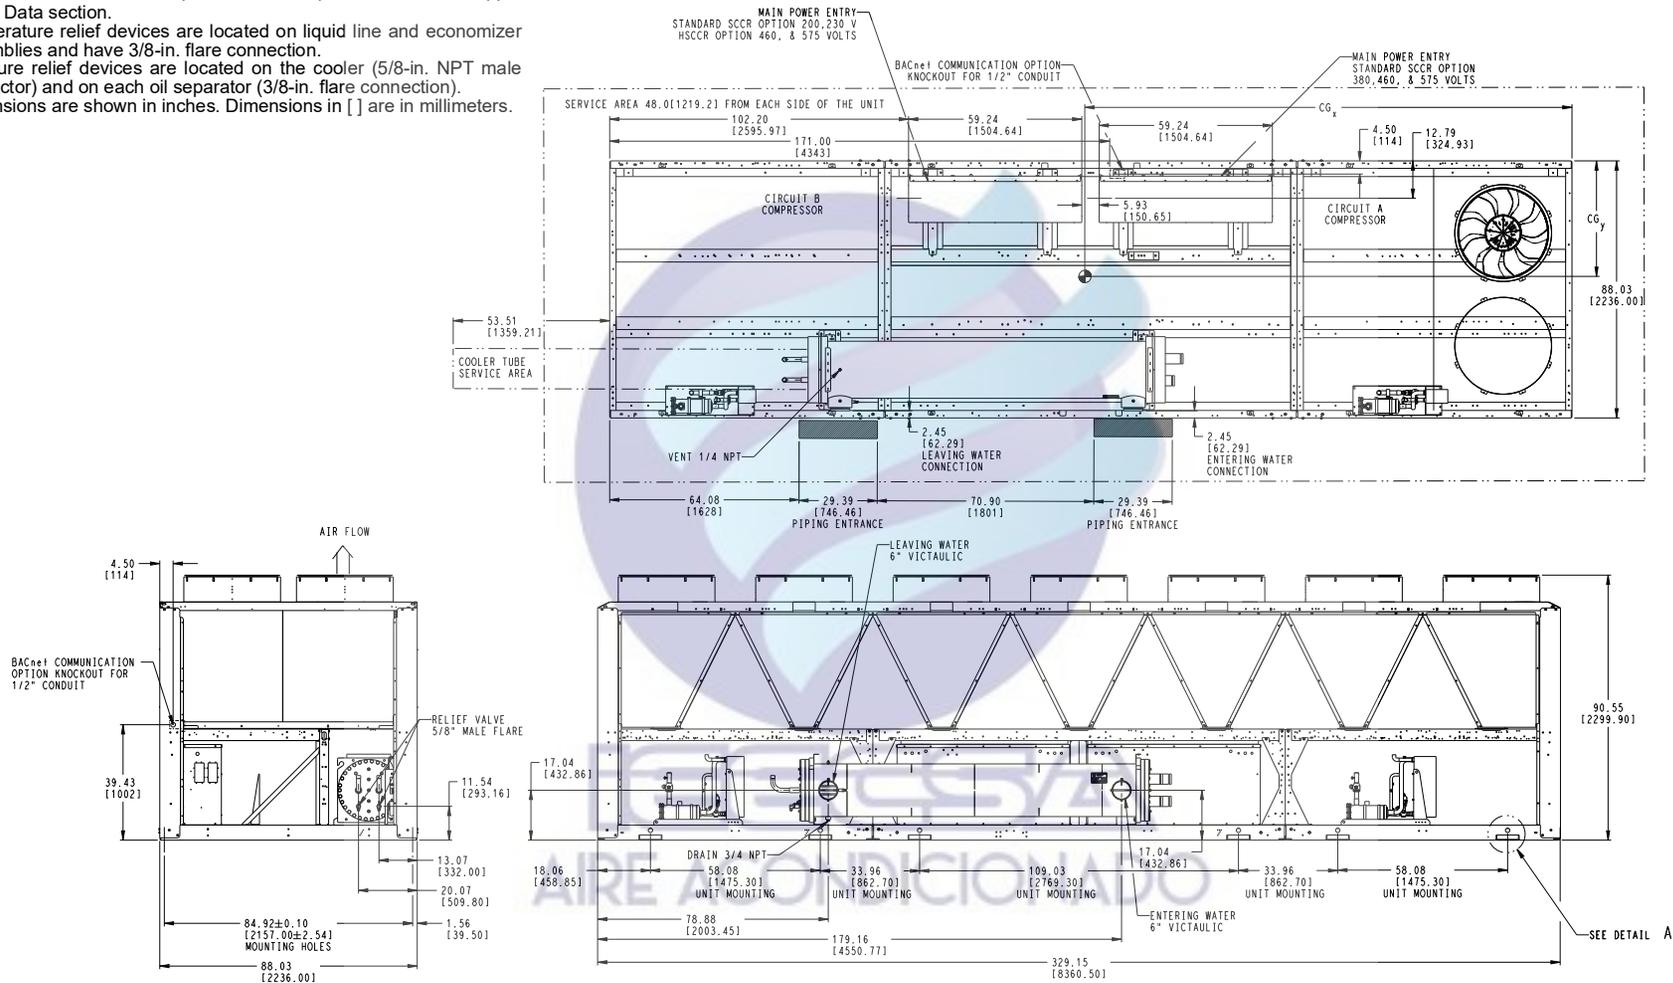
30XA220,240 Air-Cooled Liquid Chiller Dimensions (cont)
